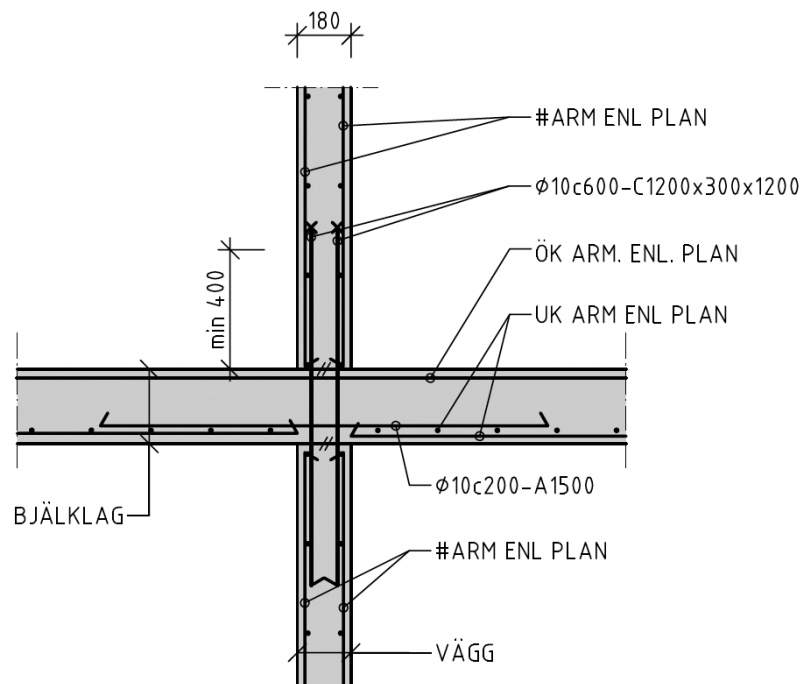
Principle detail B showing the wall-slab connection in the Troja project, including slab thickness, wall thickness and indicated reinforcement [30].
